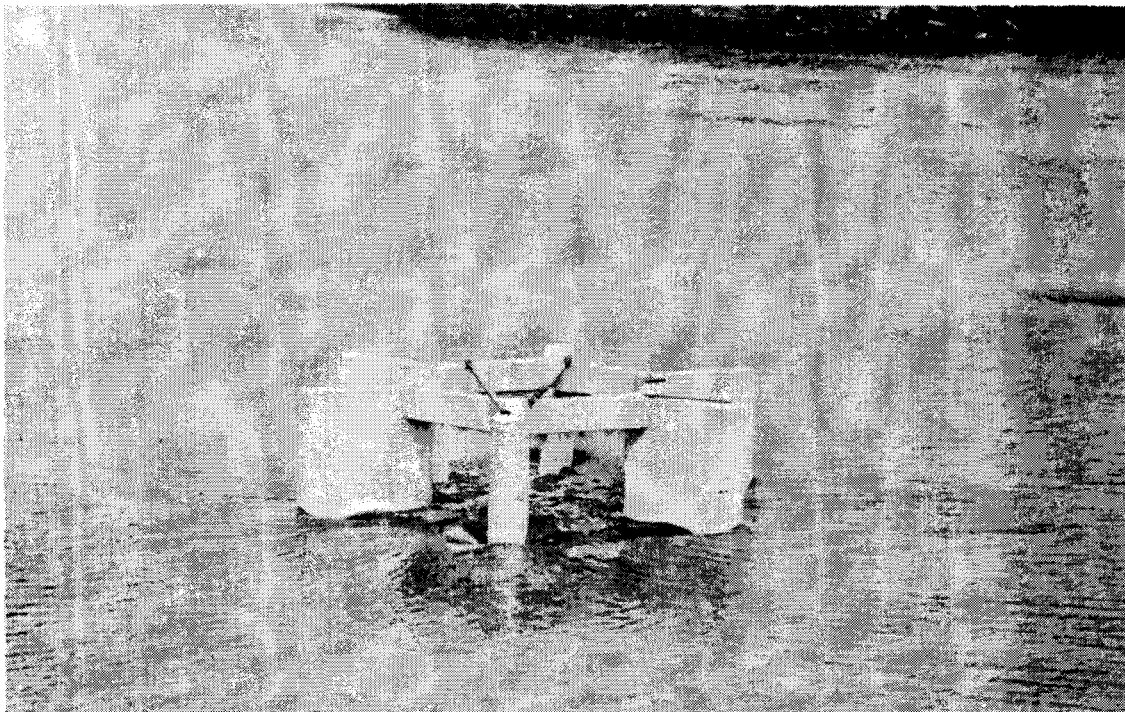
Spillway discharge was 3,090 cfs April 28, and reservoir elevation was 2071, about 0.7 foot above the point at which flow changes from submerged to free. The "mushroom" surged no more than a few inches.
